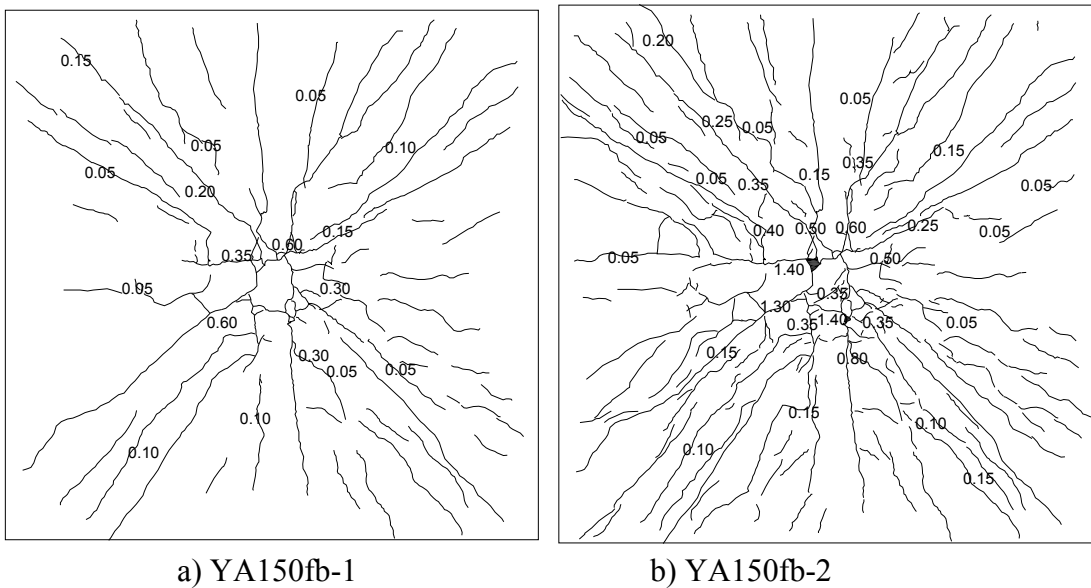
Impact crack profiles on the back face of the specimen YA150fb
